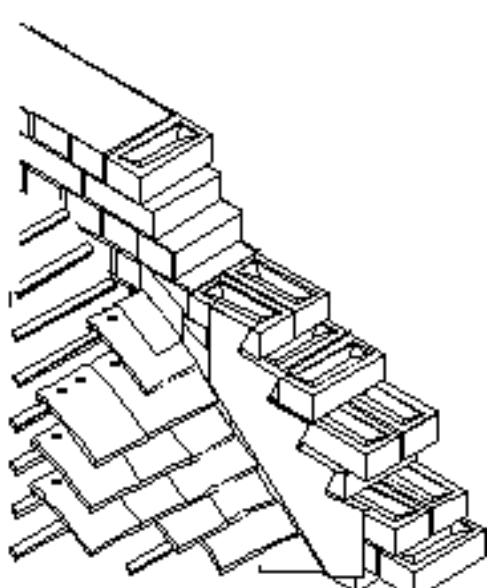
A DPC, cavity tray and flashing is needed to prevent rainwater percolating down a wall: not easy when the pitch of the roof differs from the rake of the bond
